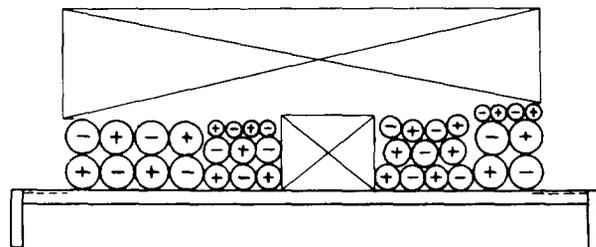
Power and Switchboard Cable on Cable Rack - Typical Section
